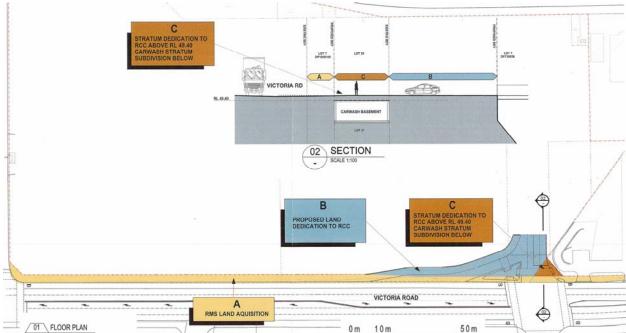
Plan showing the area to be affected by a stratum subdivision and the area to be dedicated to Council.
